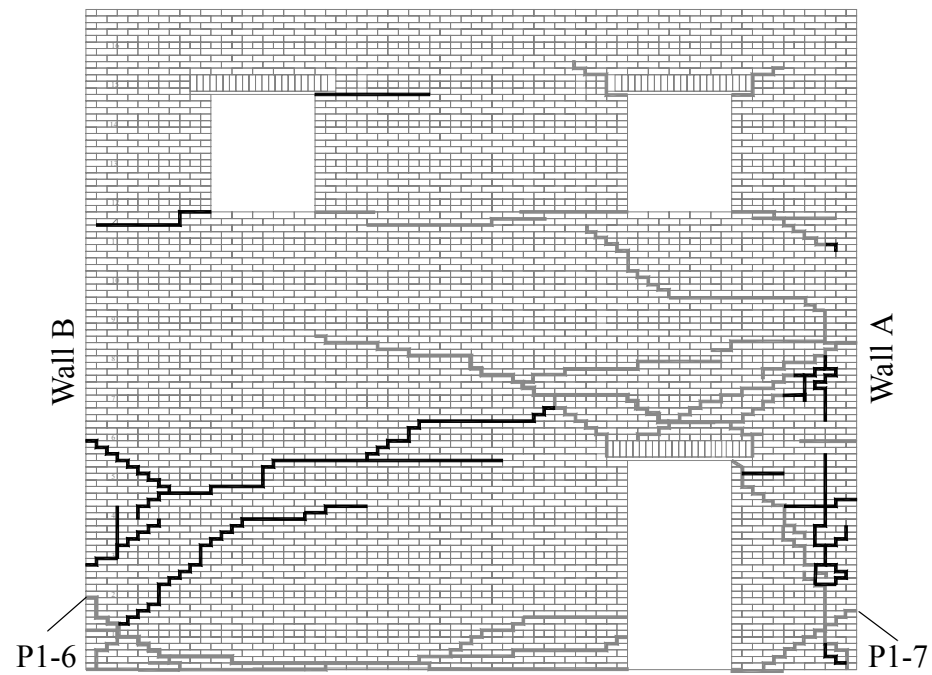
Crack pattern in Wall 1 following Test Run 41.
